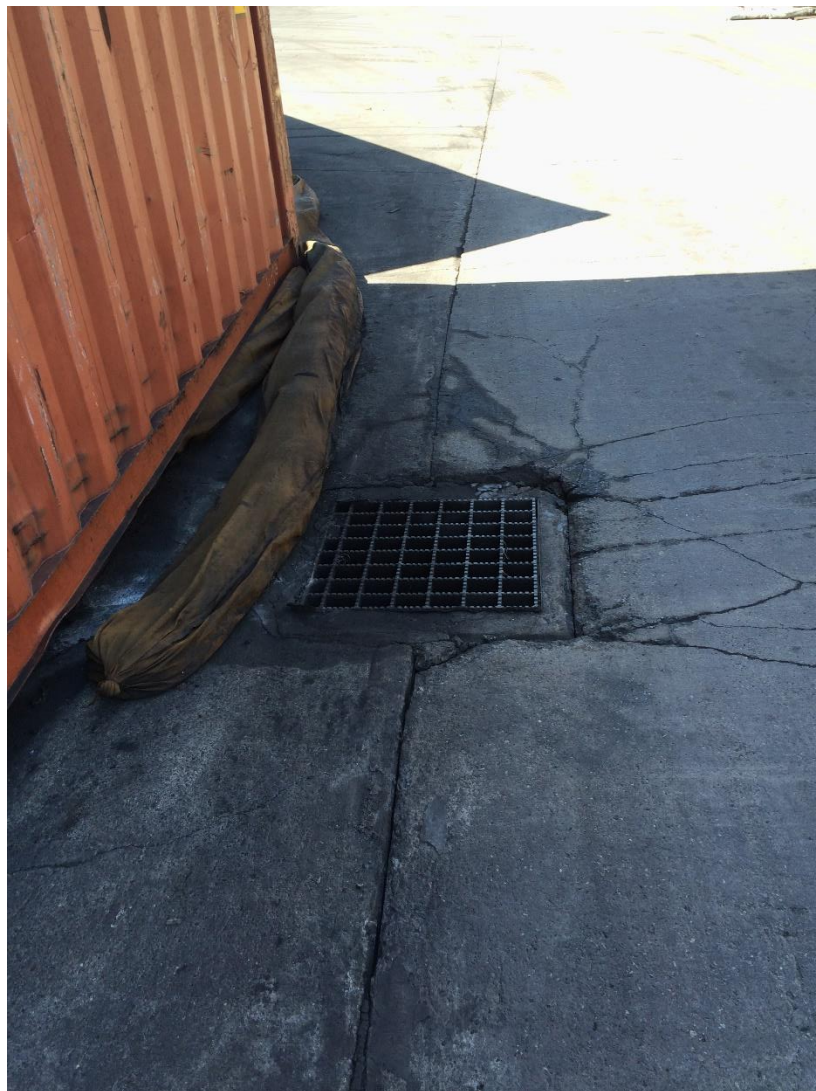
Looking south toward drain inlet 3DI-11 along western alley of secondary storage area: surficial cracking and concrete seam in SW-3 area.
